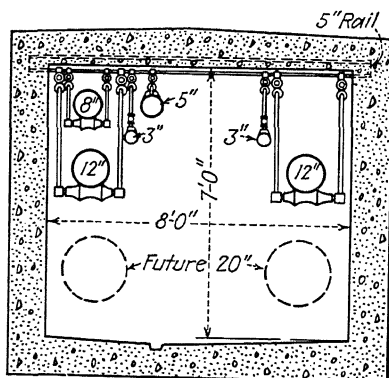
Typical cross section of a shallow tunnel—usually built by cut-and-fill methods.
